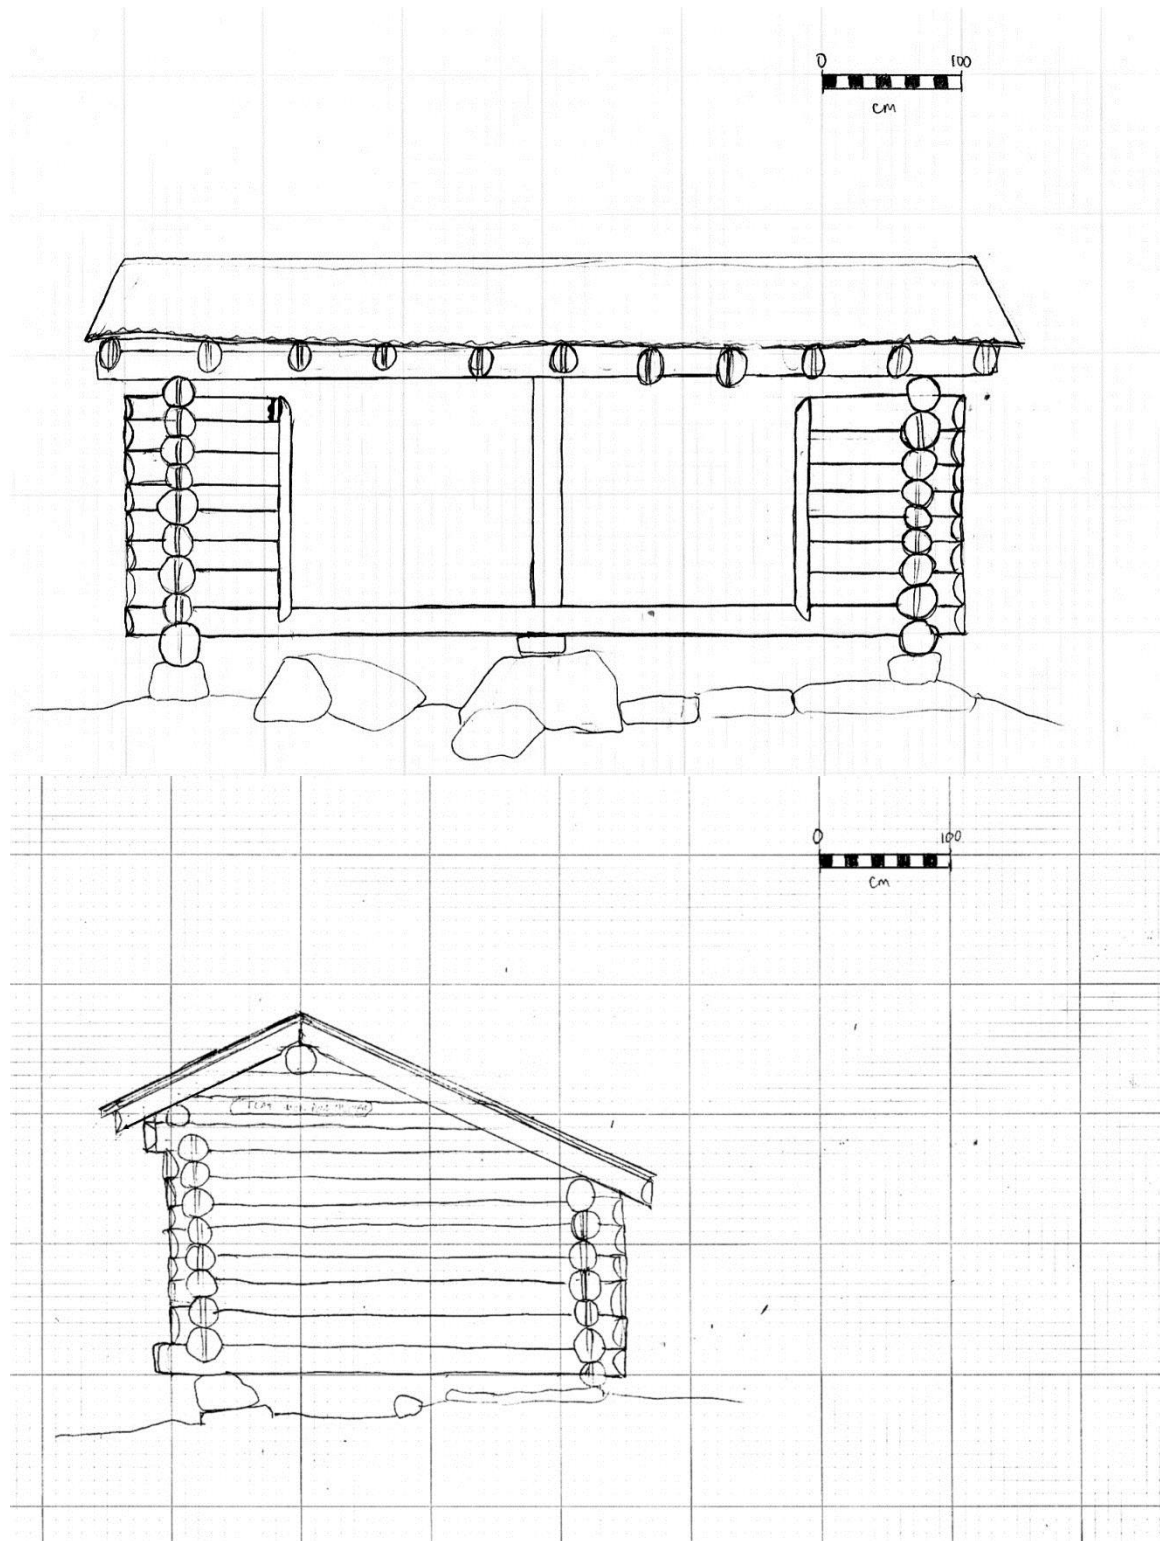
Flat Mountain Pond shelter drawings. Above: East (front) elevation. Below: North side elevation. August 10, 2011.
